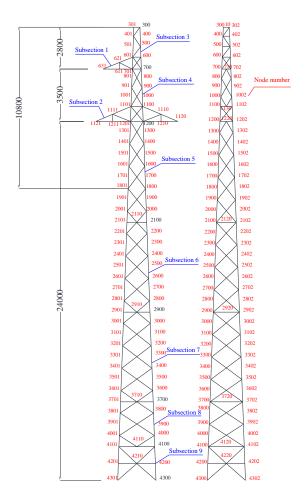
Profile and wind pressure subsections of the tangent tower (Unit:mm) $% \label{eq:figure}%$
